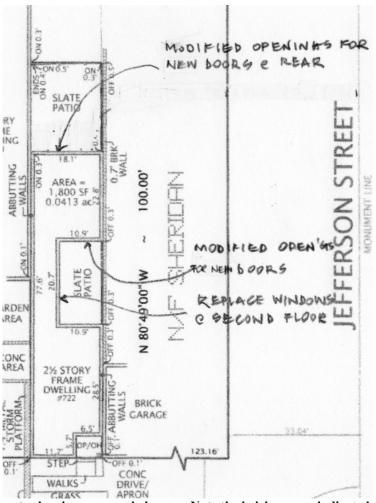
Plat of property showing proposed changes. Note the brick garage indicated adjacent to the house which will block any view of the proposed changes.
